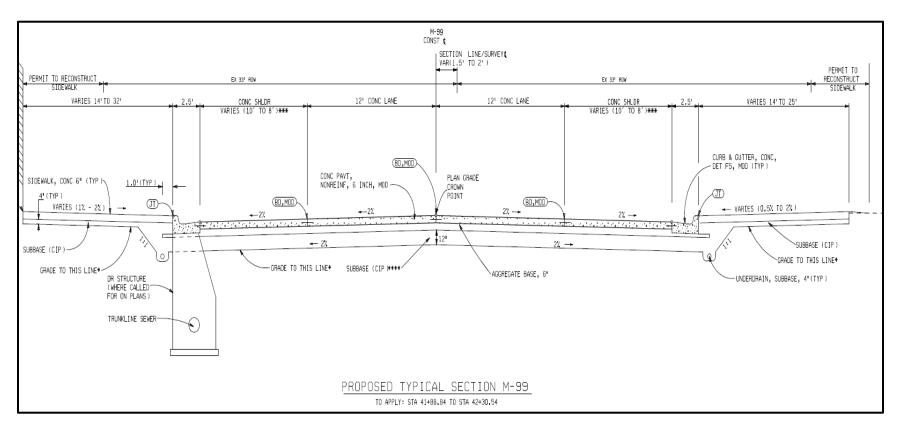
Proposed Typical Section M-99 (4 lanes)
